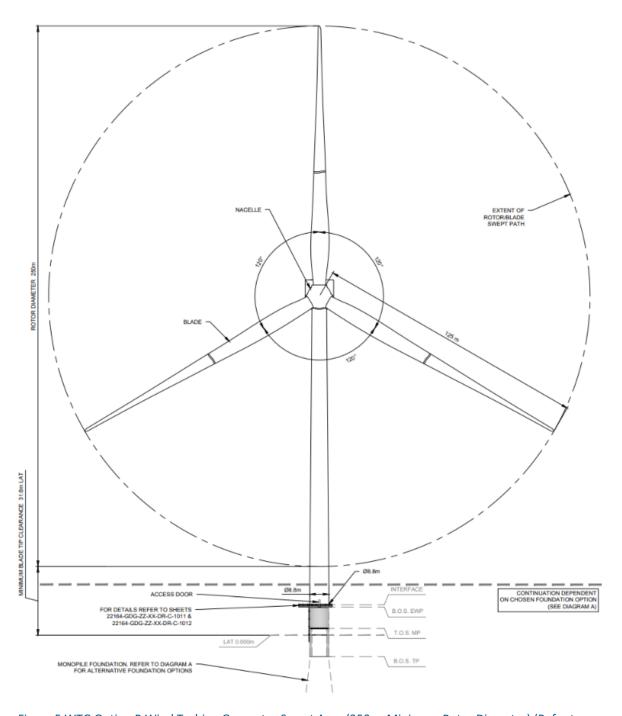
WTG Option B Wind Turbine Generator Swept Area (250 m Minimum Rotor Diameter) (Refer to drawing 22164-GDG-ZZ-XX-DR-C-1001)
